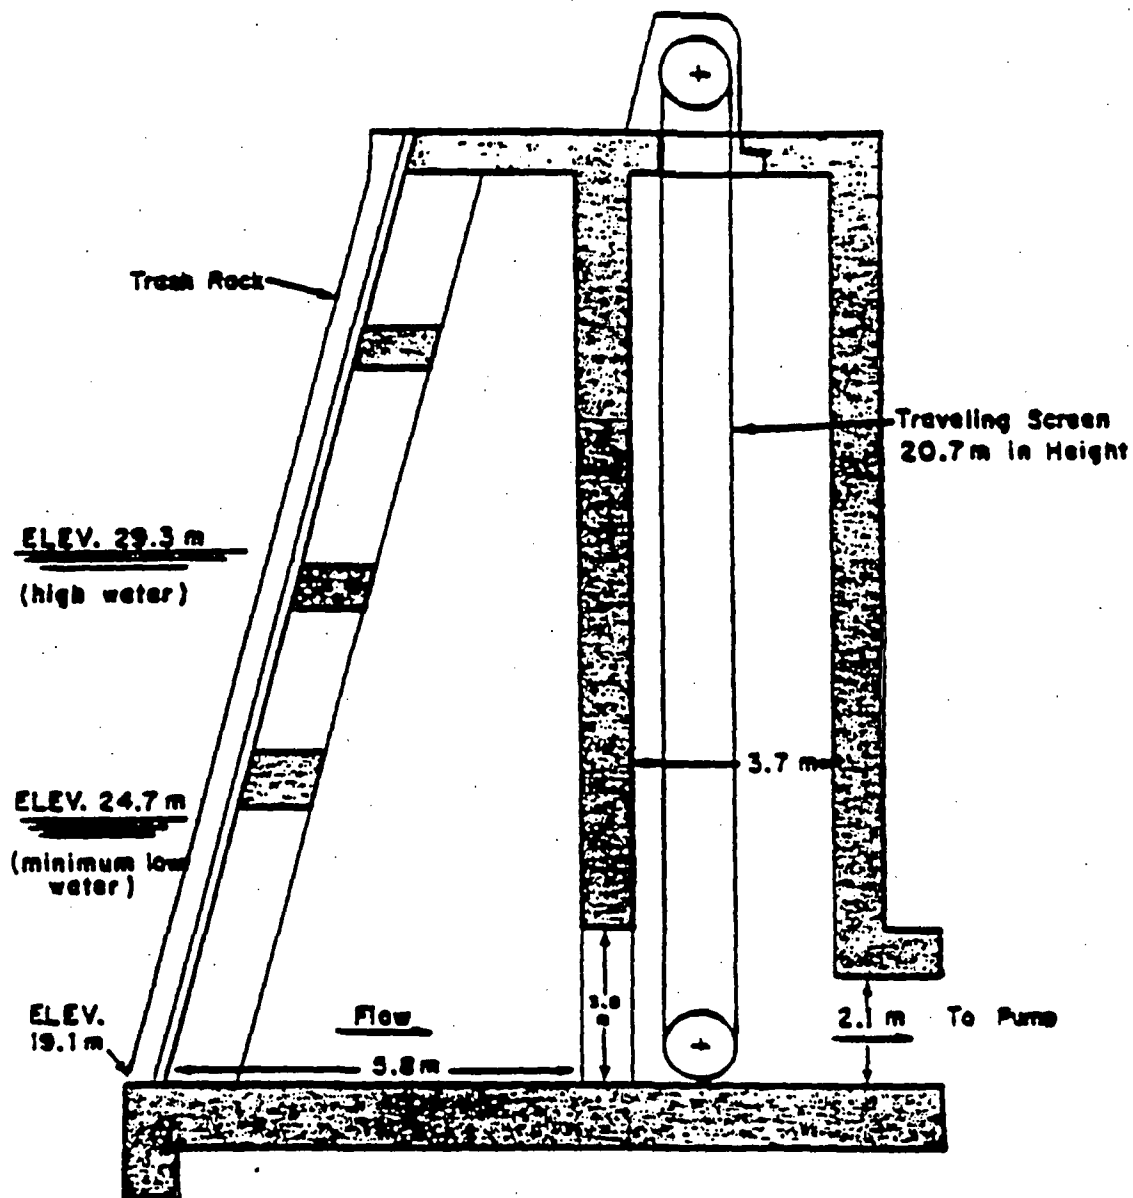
Schematic of 1G and 3G Pumphouse Intake, Elevation View
